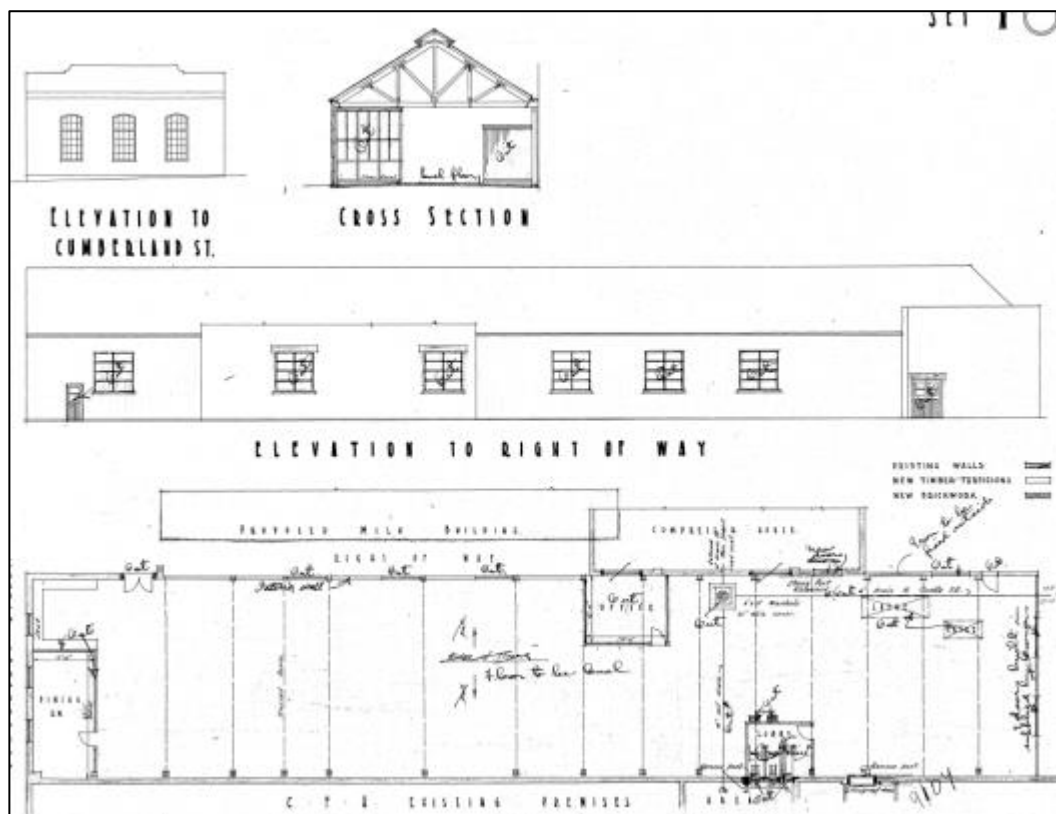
1940 Plan for refitting the Engineers and Fitting shops (No. 1 in 1927 plan) (DDC Archive).
